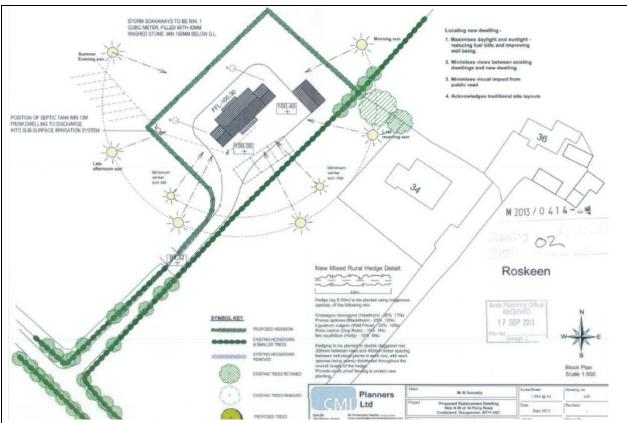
Block plan of dwelling and garage approved under M/2013/0414/F
